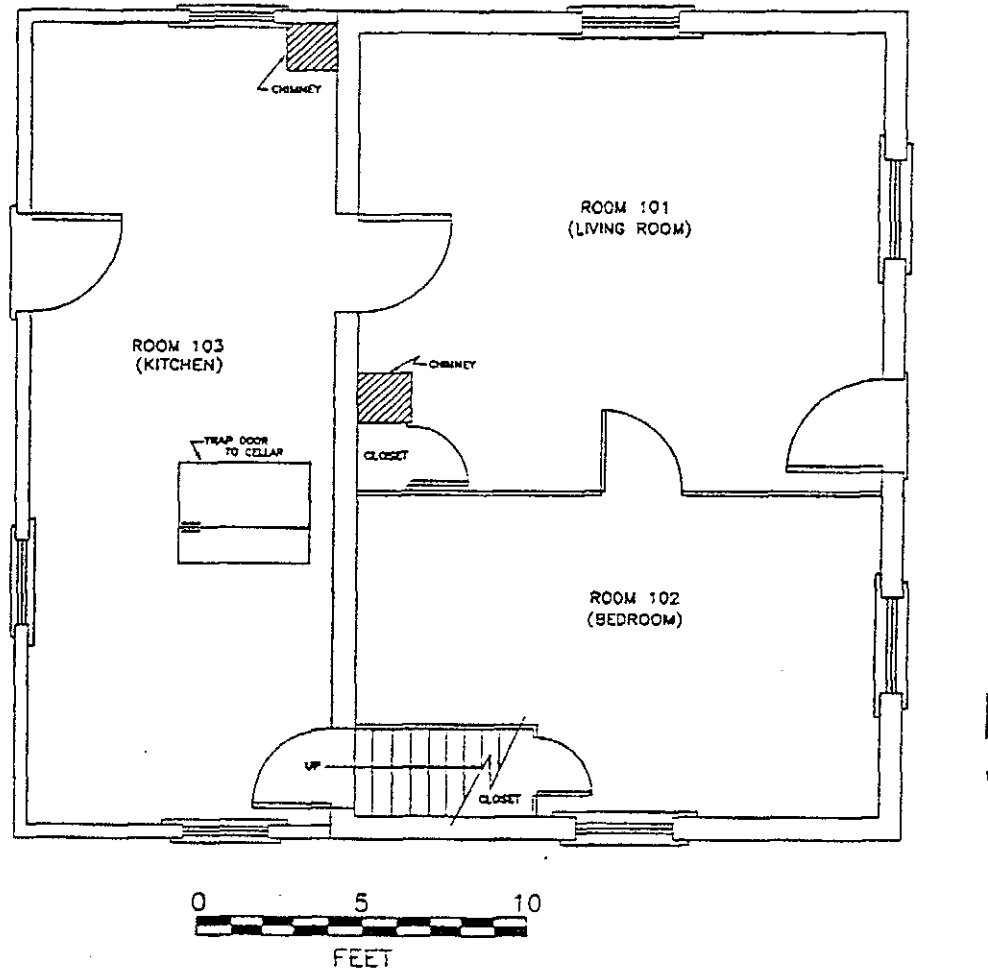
Ground floor plan of Kiel House, ca. 1890.
